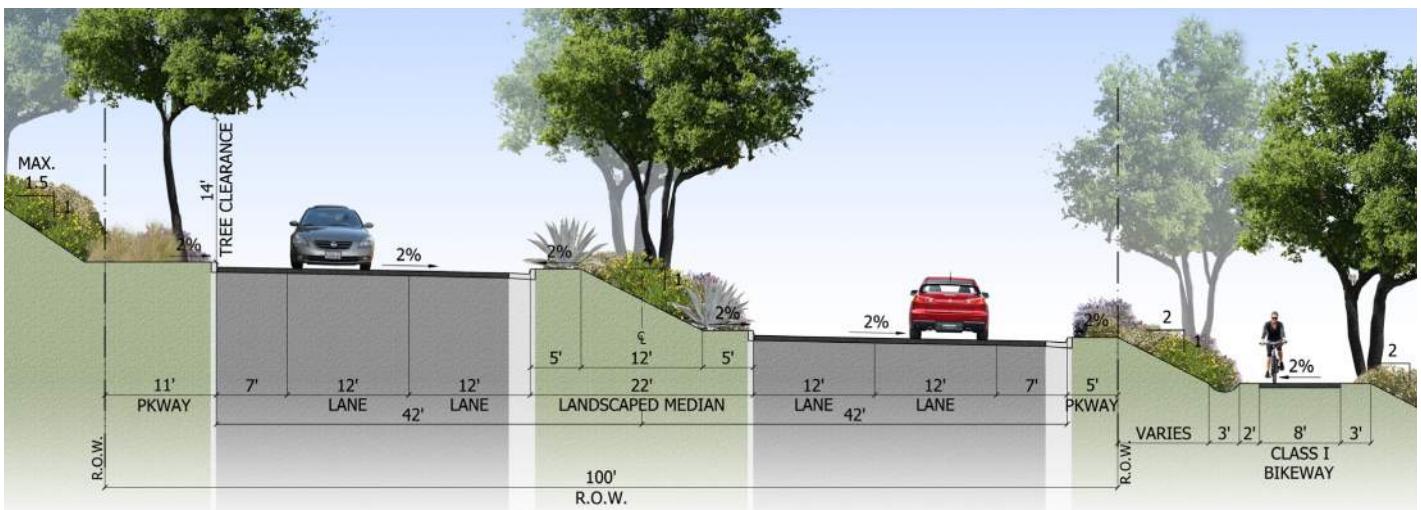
Street Section – Western Bypass Corridor 2 (Public, TTM lot L)
